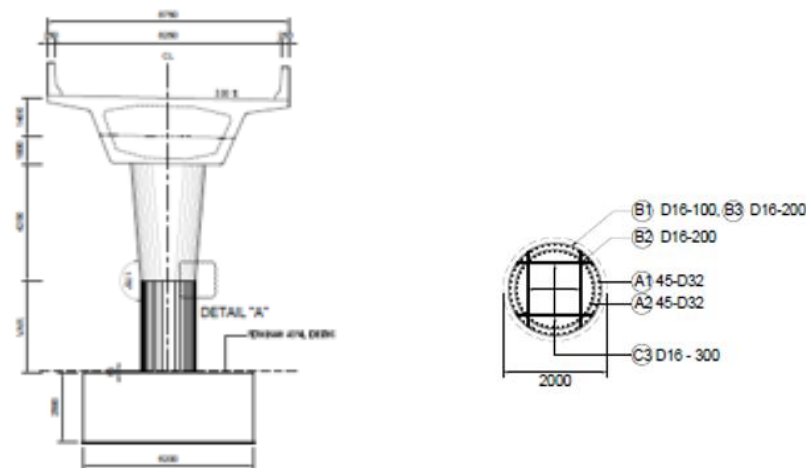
Typical pier reinforcement of existing bridge (Model 1-as built)
